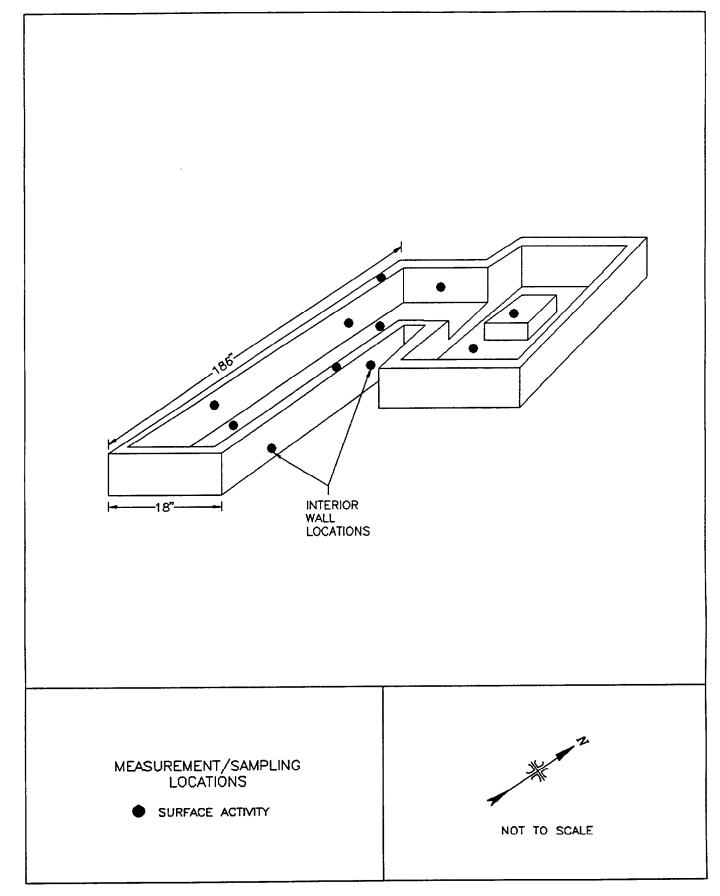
Building 3, Scale Apparatus Pit — Measurement and Sampling Locations
